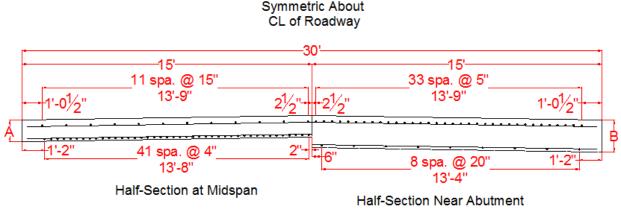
shows the reinforcement design for the 72-ft. haunched-slab section in plan view.
